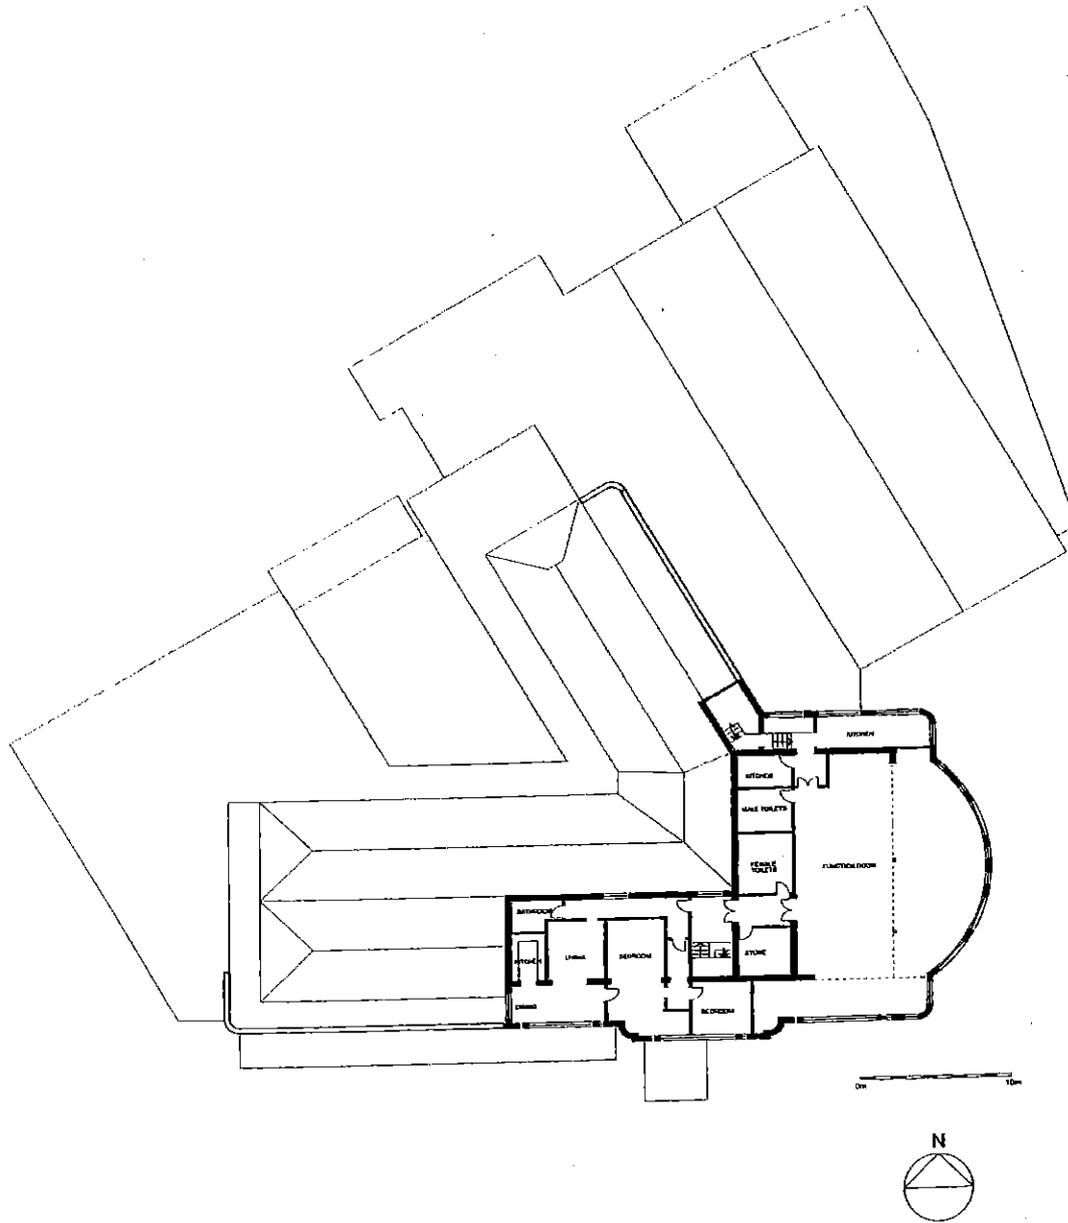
Sketch plan of first floor of Raffles Hotel 'heritage' core. From Palassis Architects' draft Conservation Plan, August 2001.
